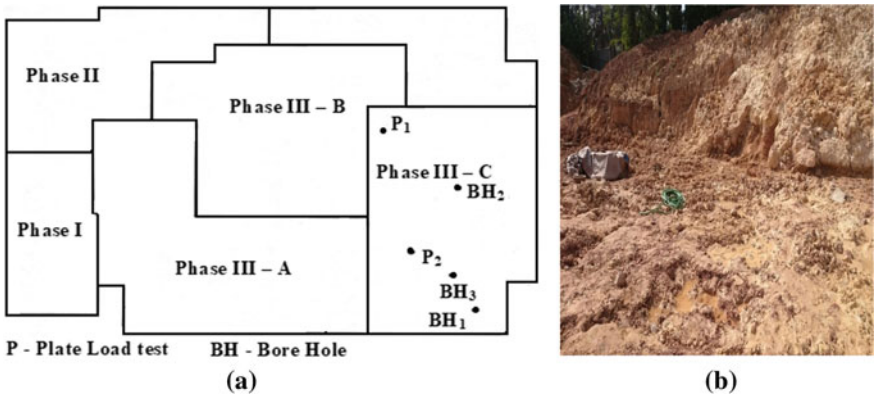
a Building layout with location of boreholes and plate load test and b soft lateritic soil at the site
